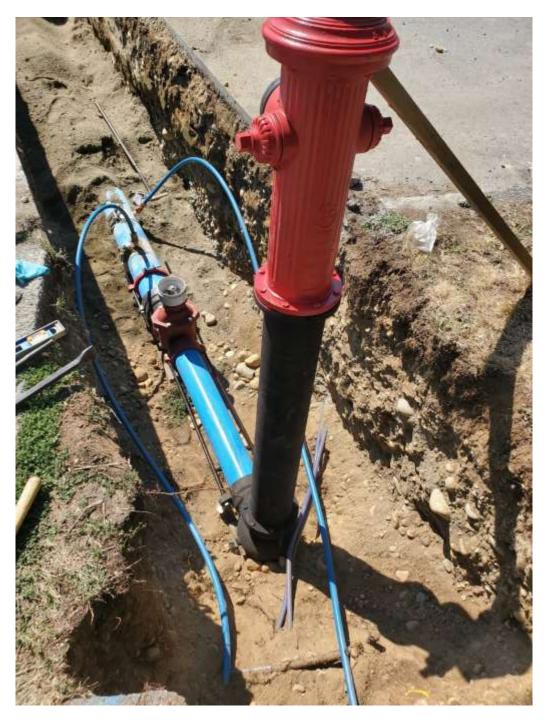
PIPE REPLACEMENT INCLUDED THE INSTALLATION OF 2 NEW FIRE HYDRANTS.
